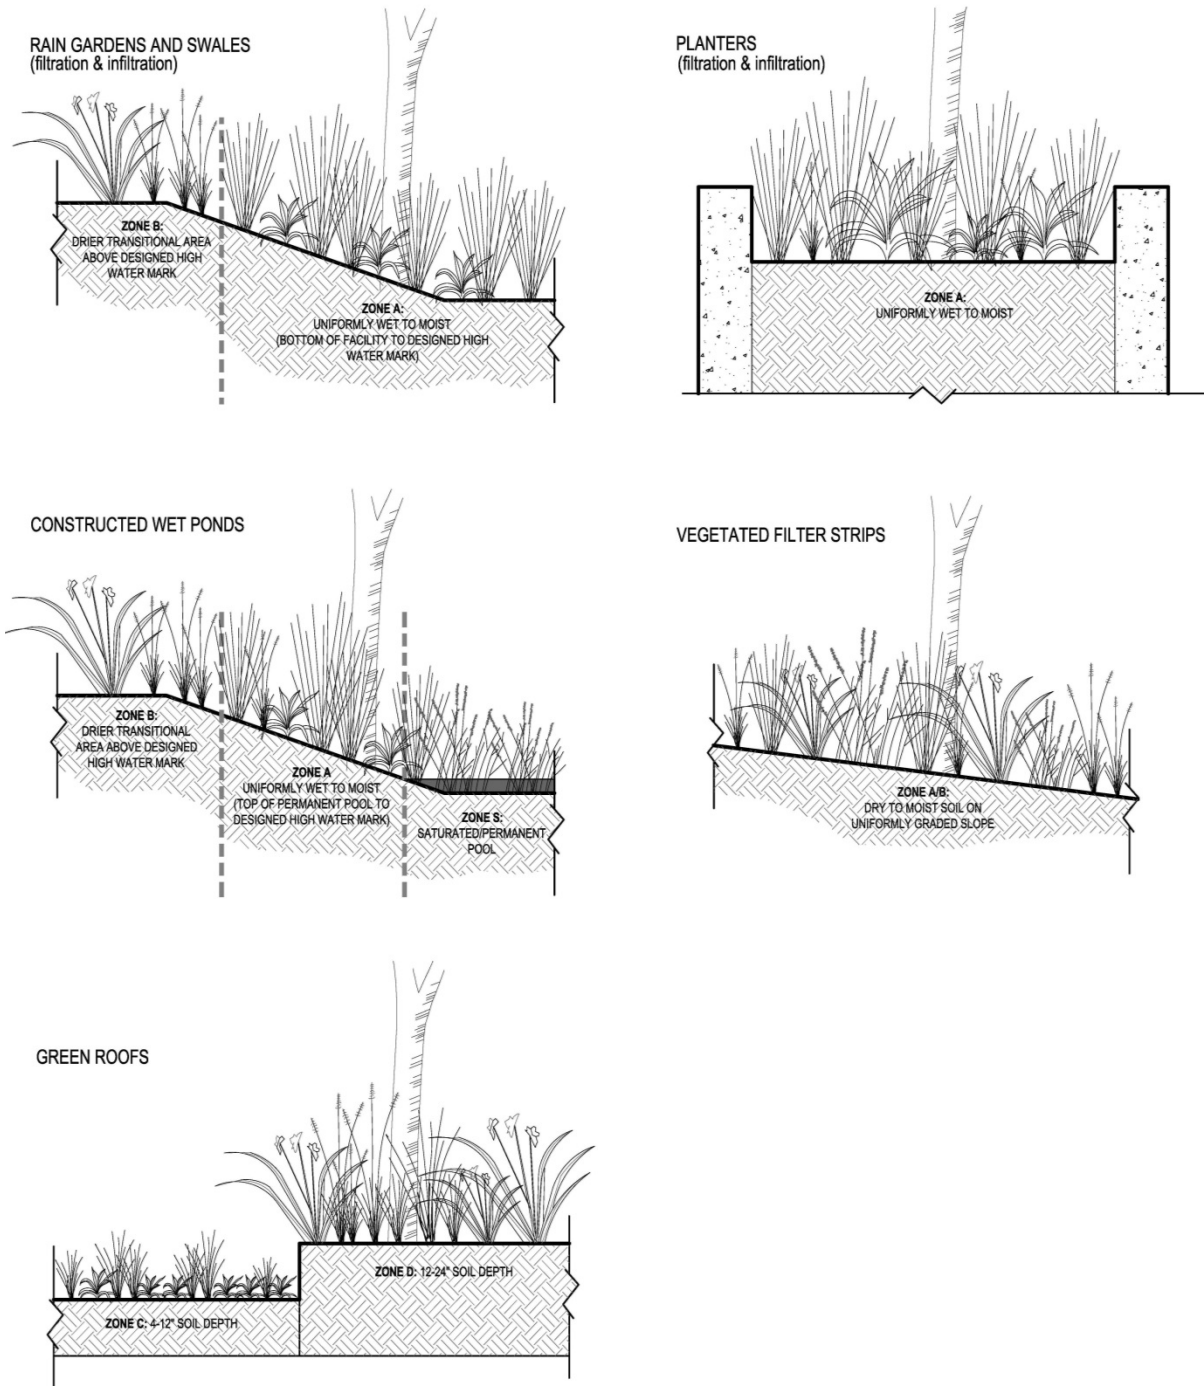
Planting Zones by Vegetated Stormwater Management Facility Type
